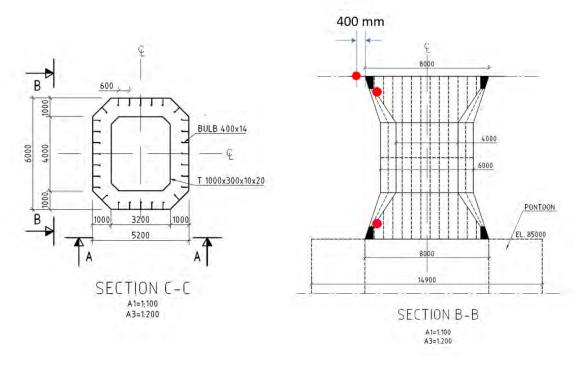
Areas of interest for bridge girder to column and column to pontoon fatigue analysis
